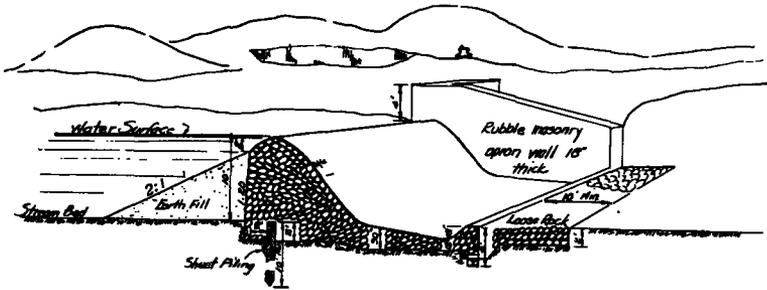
CROSS SECTION OF RUBBLE MASONRY
